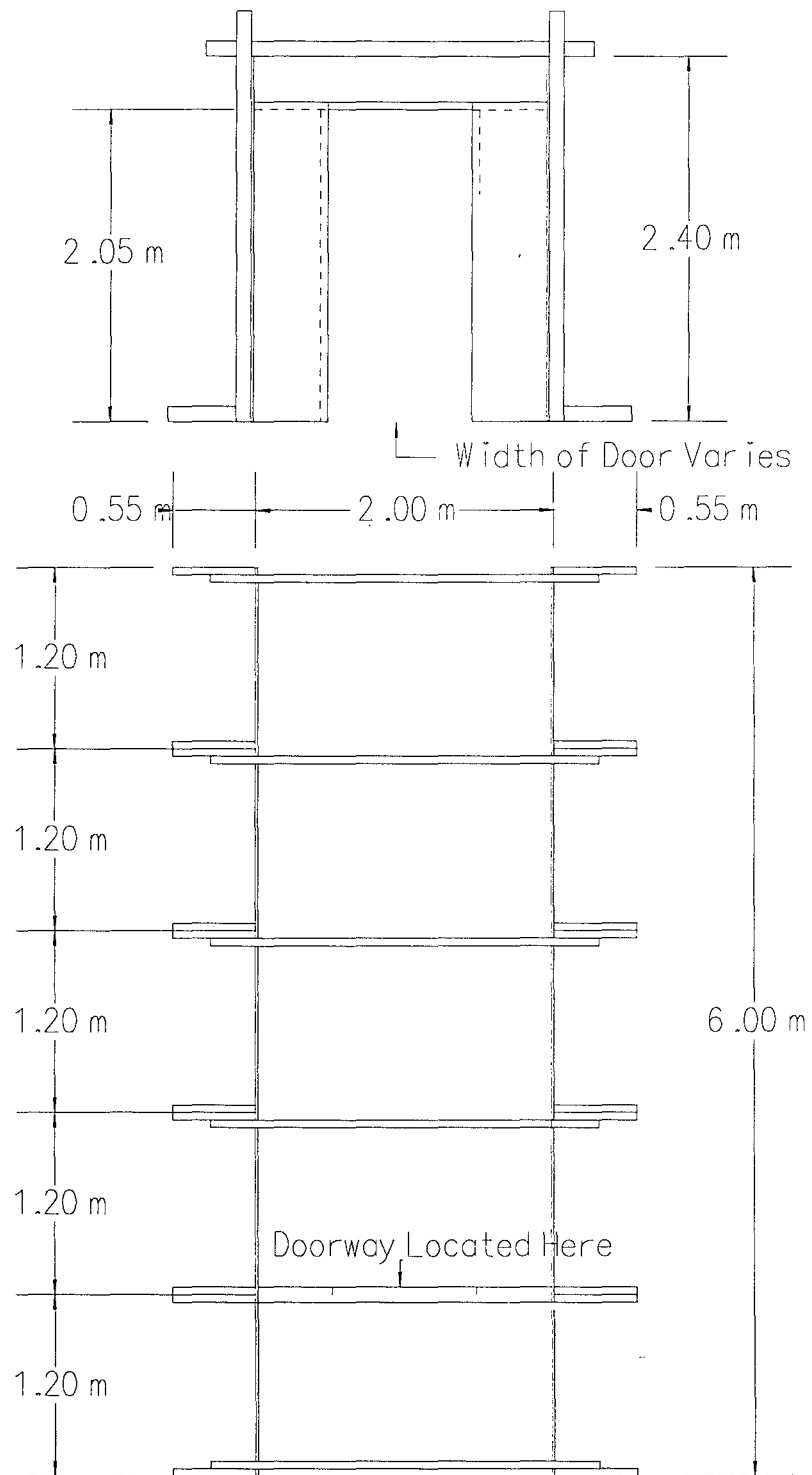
Plan and Elevation of the Doorway and Corridor
